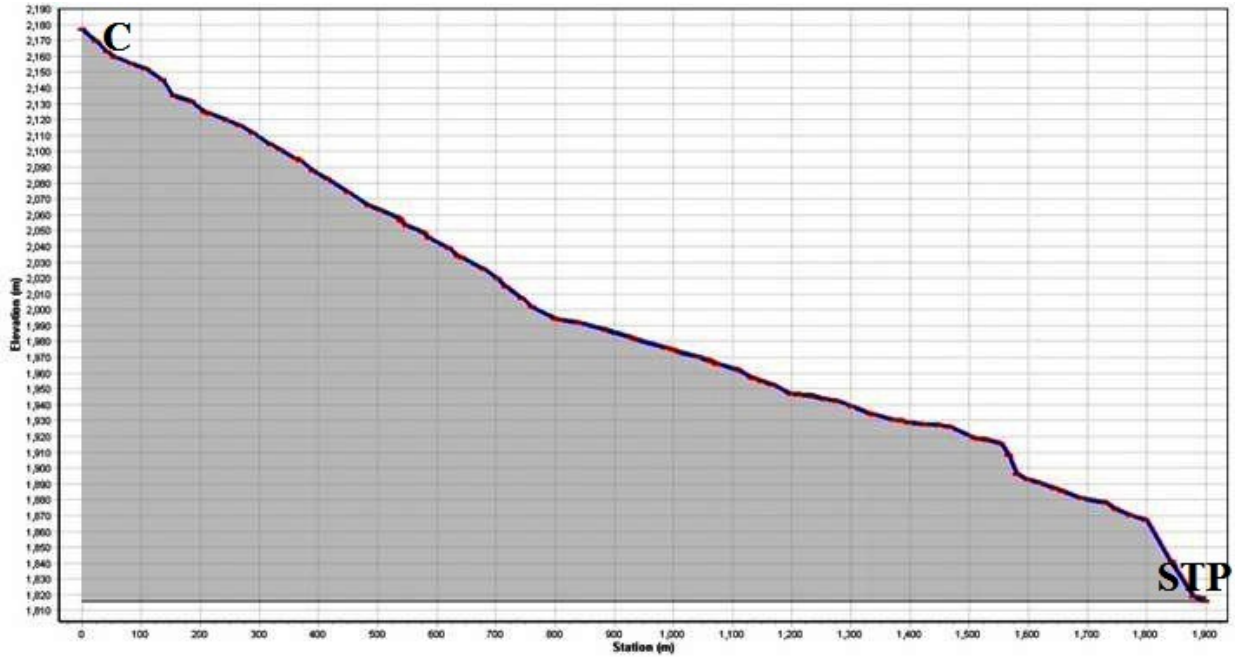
Graph Showing Elevation of Manhole, Conduits and Out Fall from Point C to STP
